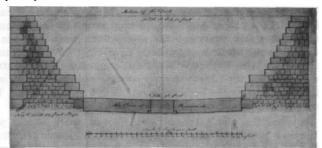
Section through Dry Dock showing Stone Bottom 1788.
